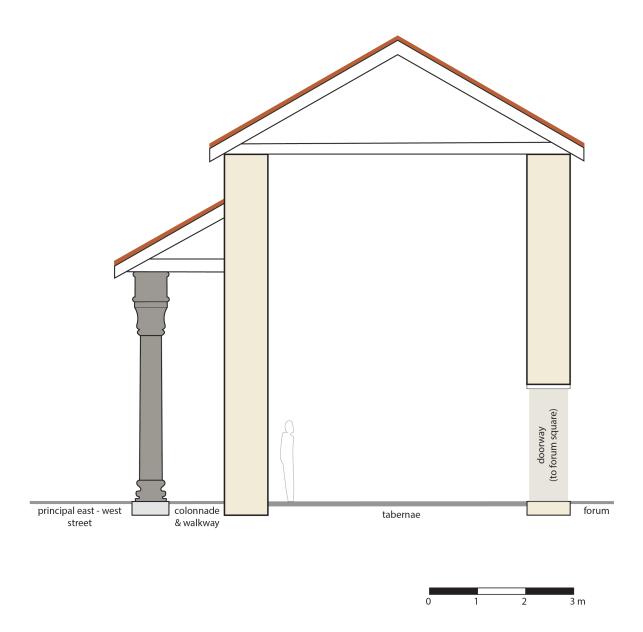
Reconstruction drawing of the cross section through the excavated rooms of the north range of the forum, facing east. (Drawing: Rose Ferraby).
